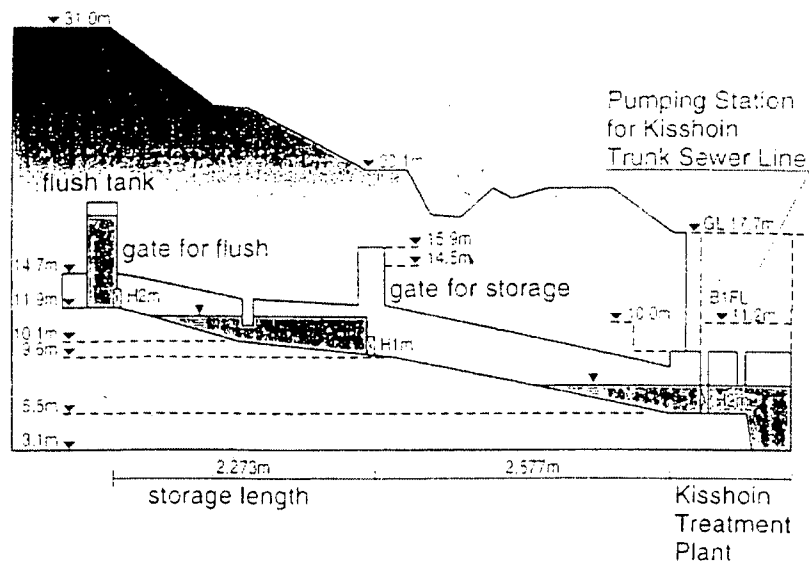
Kisshoin Trunk Sewer in Kyoto⁶⁾
